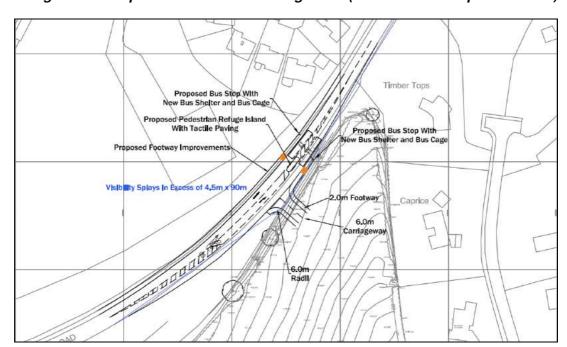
Proposed Site Access Arrangement (Main Access off Ipswich Road)
